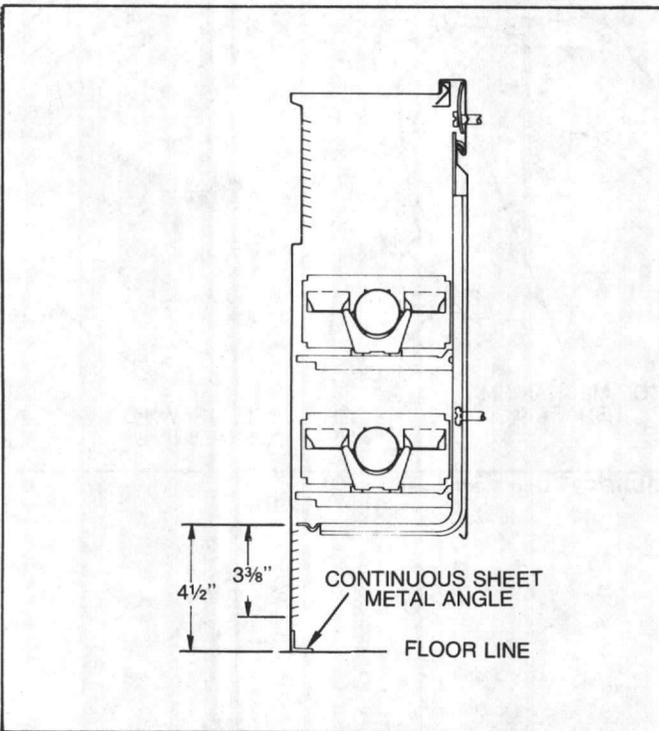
Front Inlet Enclosure with Sheet Metal Angle
